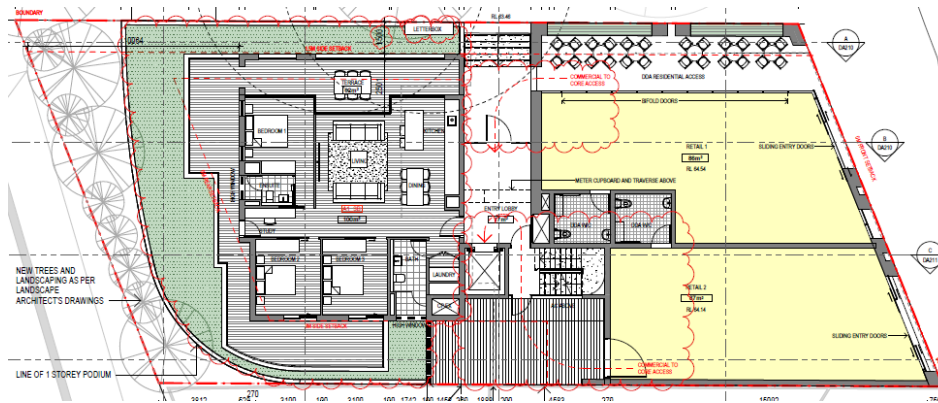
First revision of level 1 floor plan under the subject DA - 18-20A Perouse Road, Randwick
